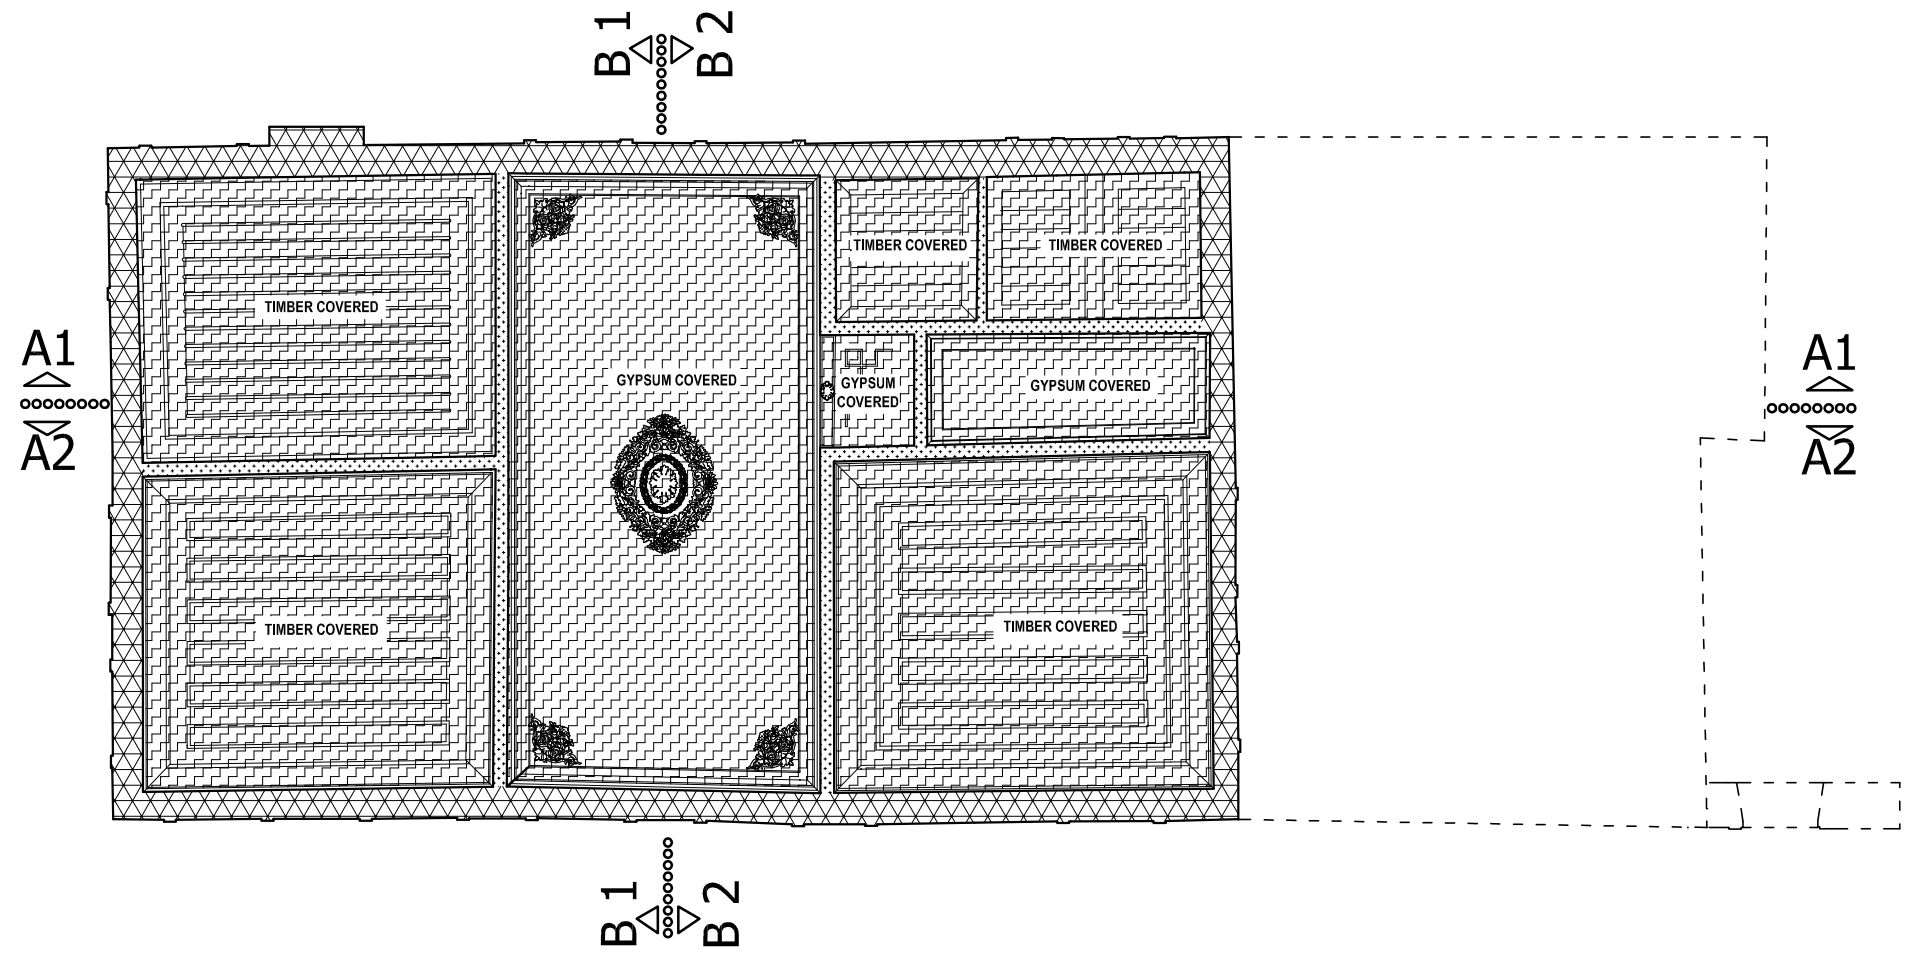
Analysis of Structural Characteristics- Mezzanine Floor Ceiling Plan
